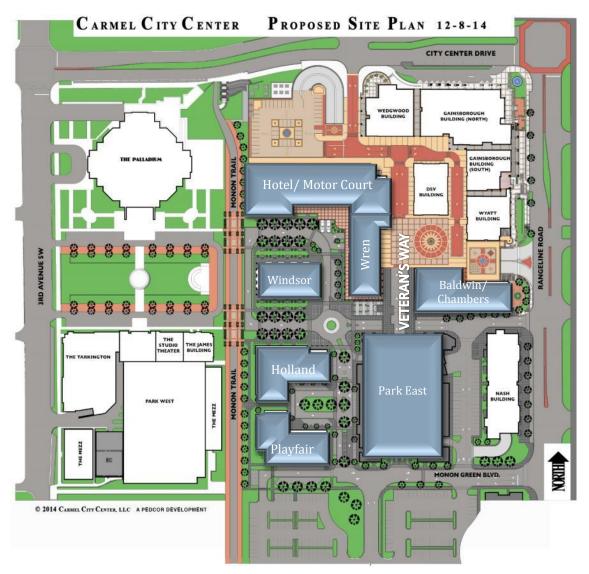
City Center Master Plan, provided by Pedcor City Center Development Company
